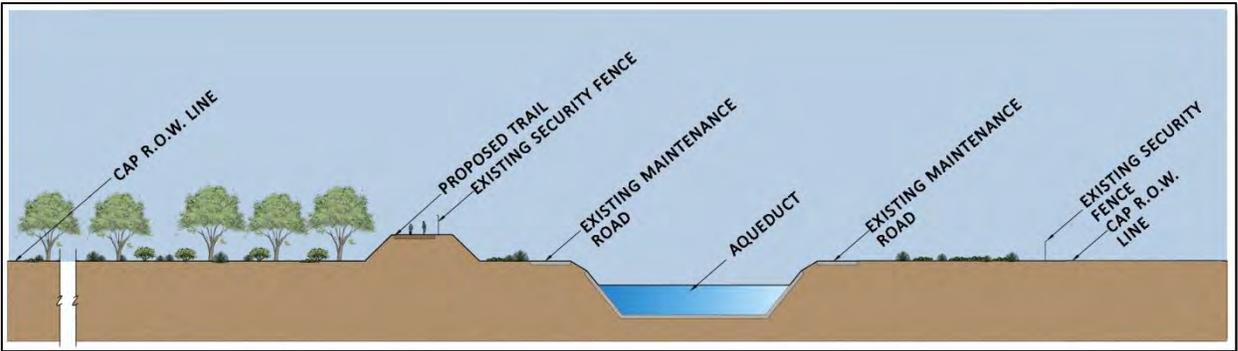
F: Cross Section PIC-1 – Typical of Mile Post 0.0 to 1.4, 4.6 to 6.5, and 7.4 to 10.0
